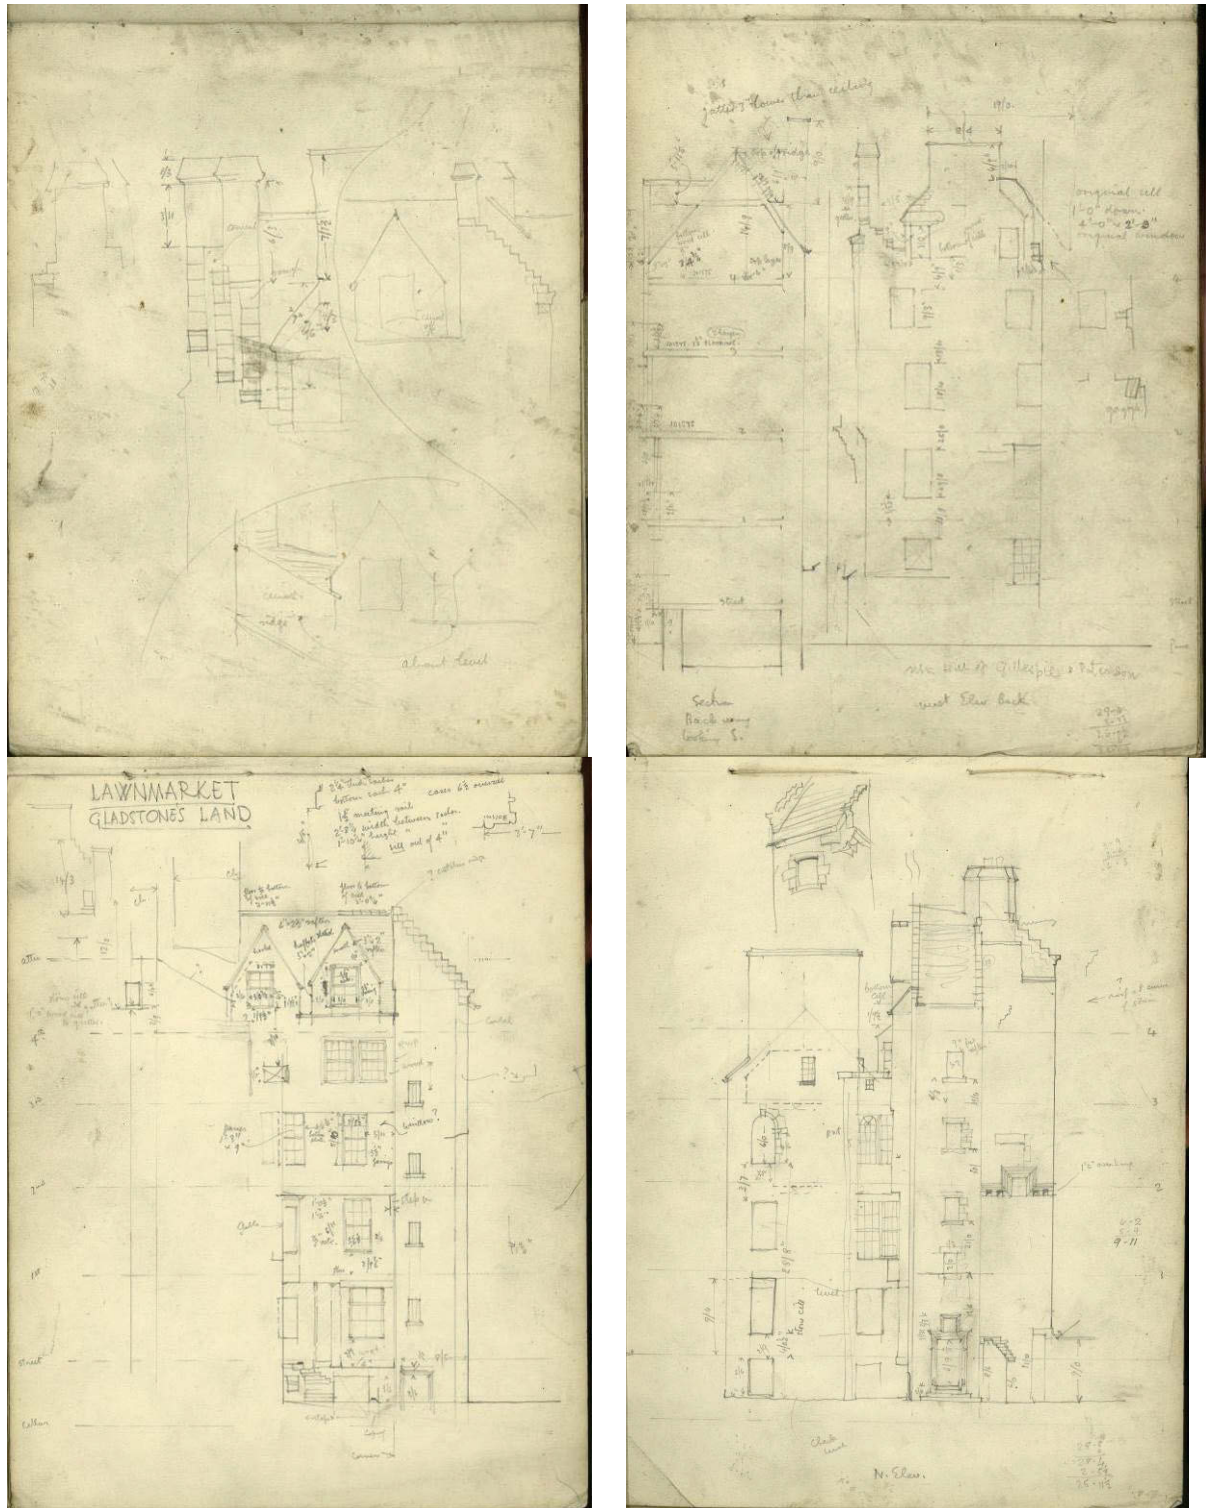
Working drawings as existing, 1937, Frank Mears. Clockwise from top left: chimneys etc.; section looking S and W elevation; N elevation; E elevation. NTS archives
